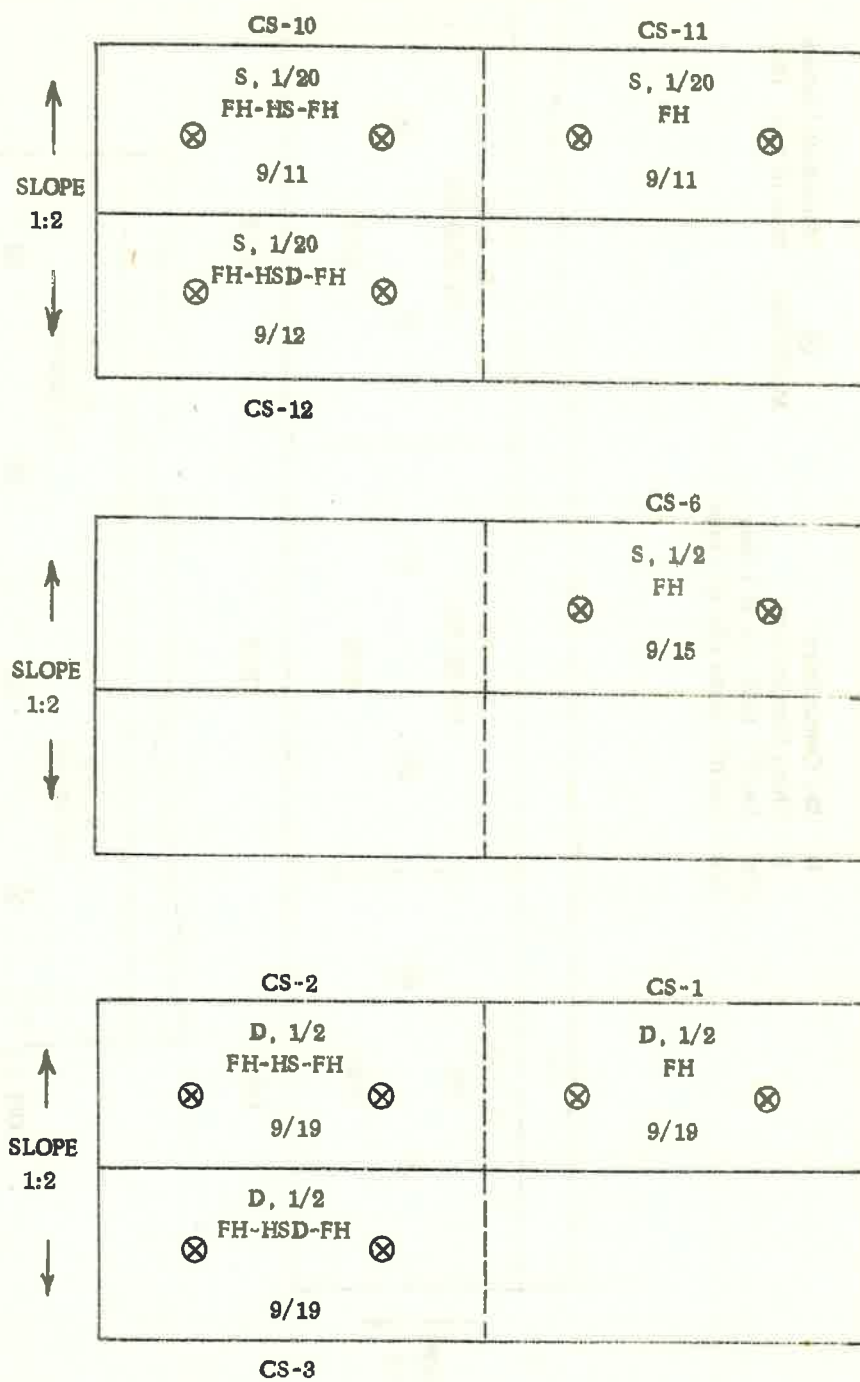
Layout of Composition Shingle Roof Test Areas
